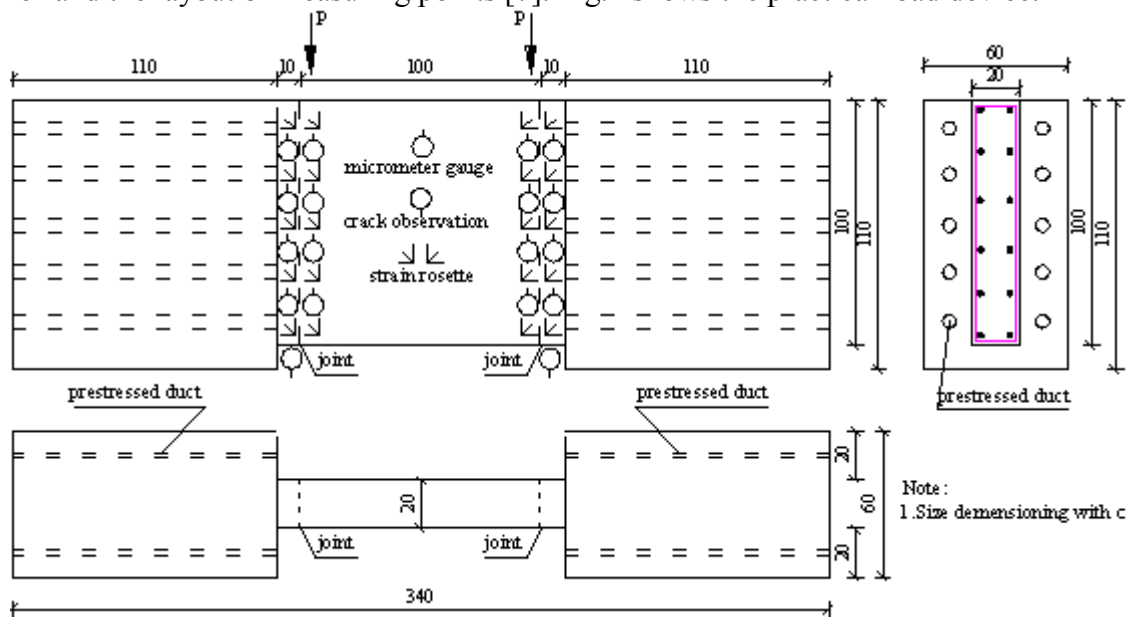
Specimen constructional detail and layout of measuring points (unit: cm)
